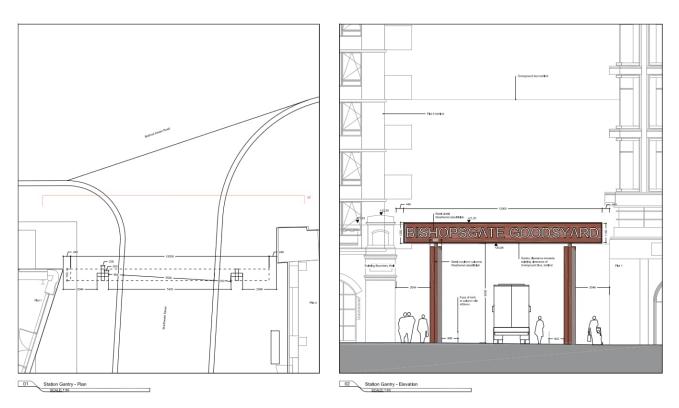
Proposed Signage Structure over Braithwaite Street
